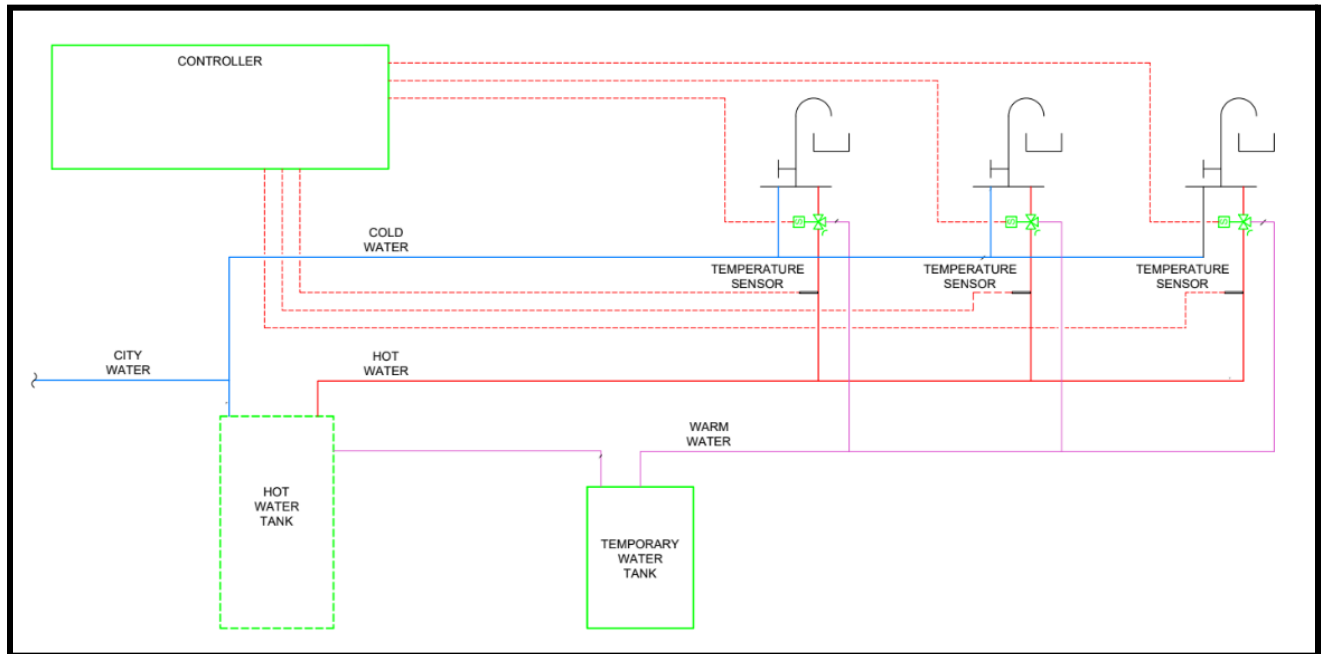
A diagram depicting how this model would be implemented into a real house or building.
